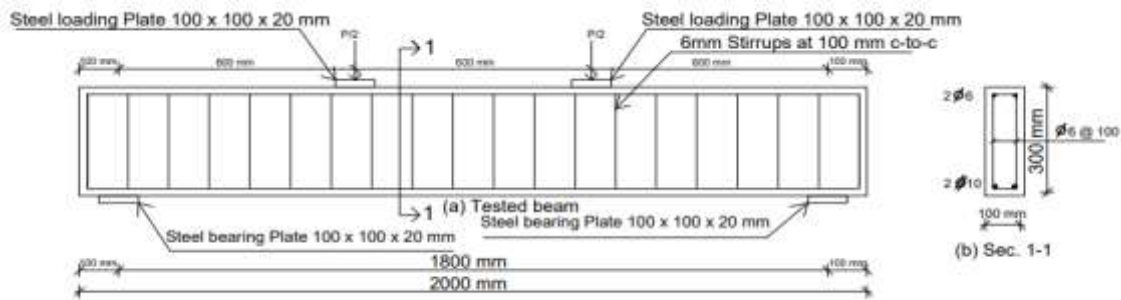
Typical dimensions and reinforcement details of beam B1 [17].
